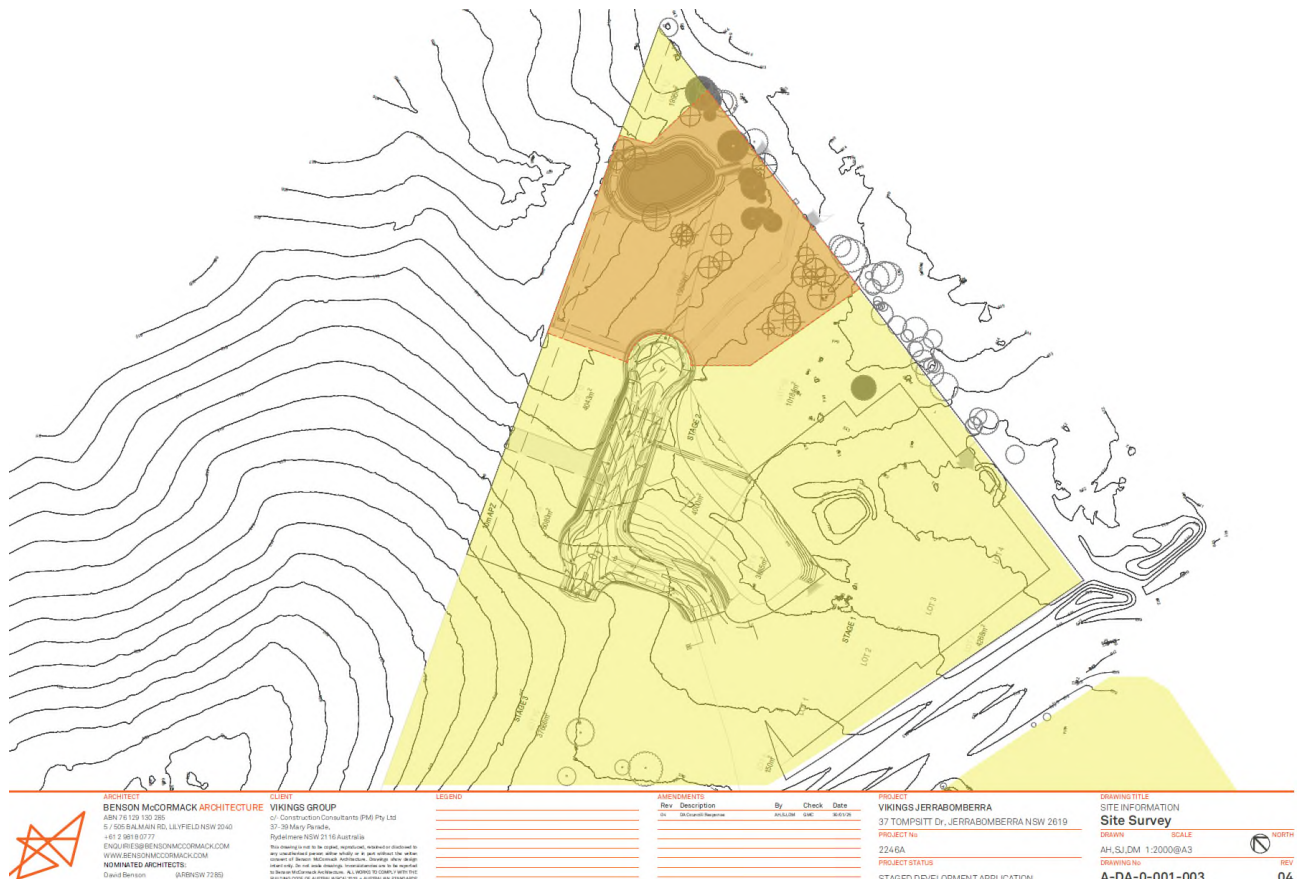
Site Survey, development site detailed in red. Source: BMA
